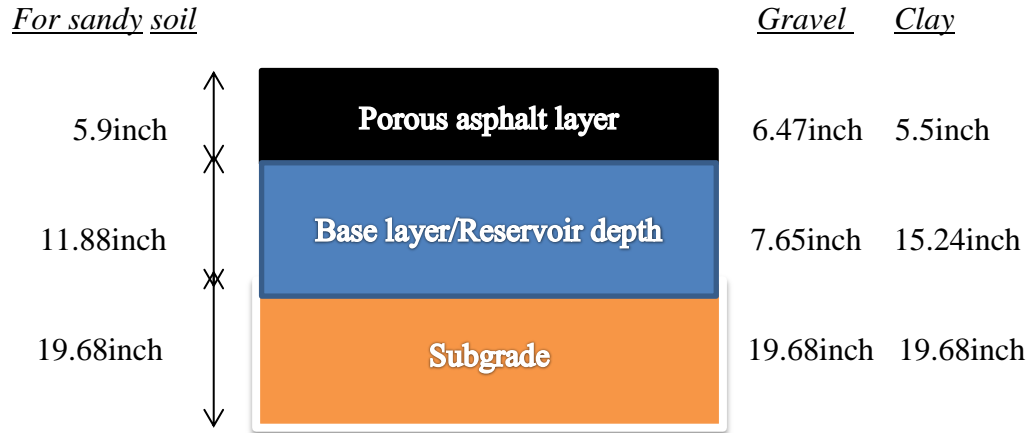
Section of Porous Asphalt Pavement as per Design of 1000000 ESALs
